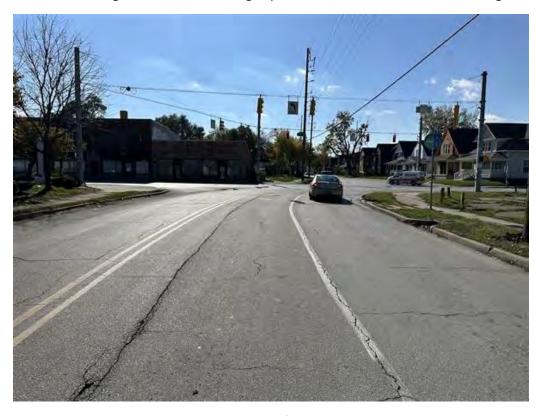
APE along N. Rural Street near  $10^{\text{th}}$  Street intersection, view facing south.
